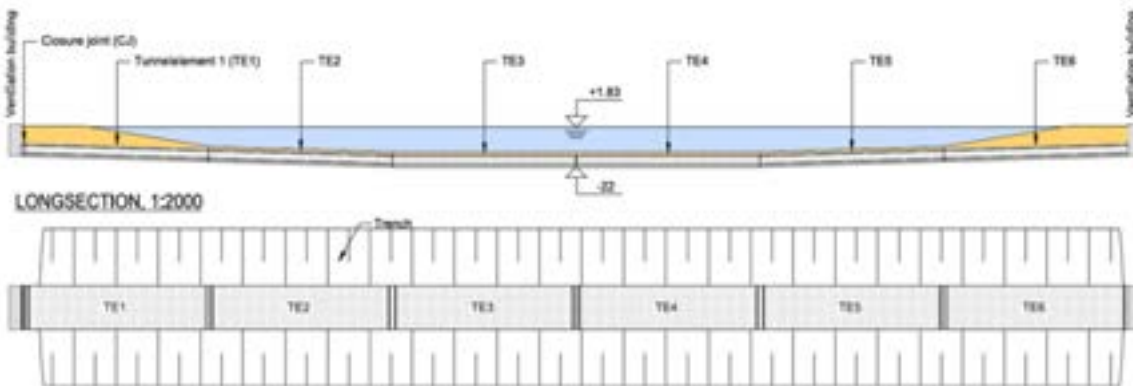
Schematic Longitudinal Section of the George Massey Tunnel (not to scale).
